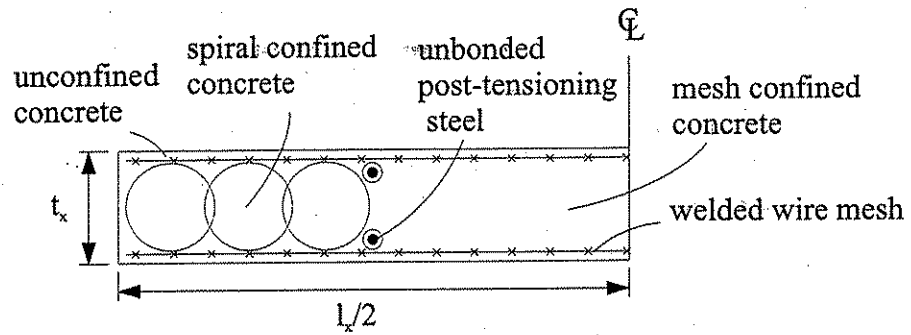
Typical cross-section of a panel near the base of the wall.
